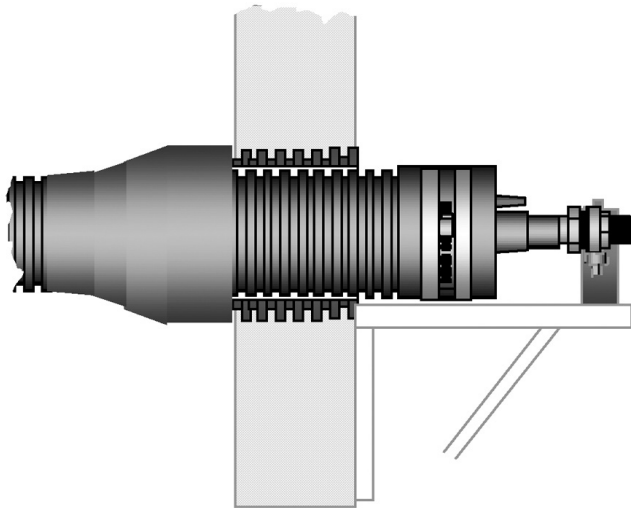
Wall Sleeve with Heat Shrink Seal Kit
